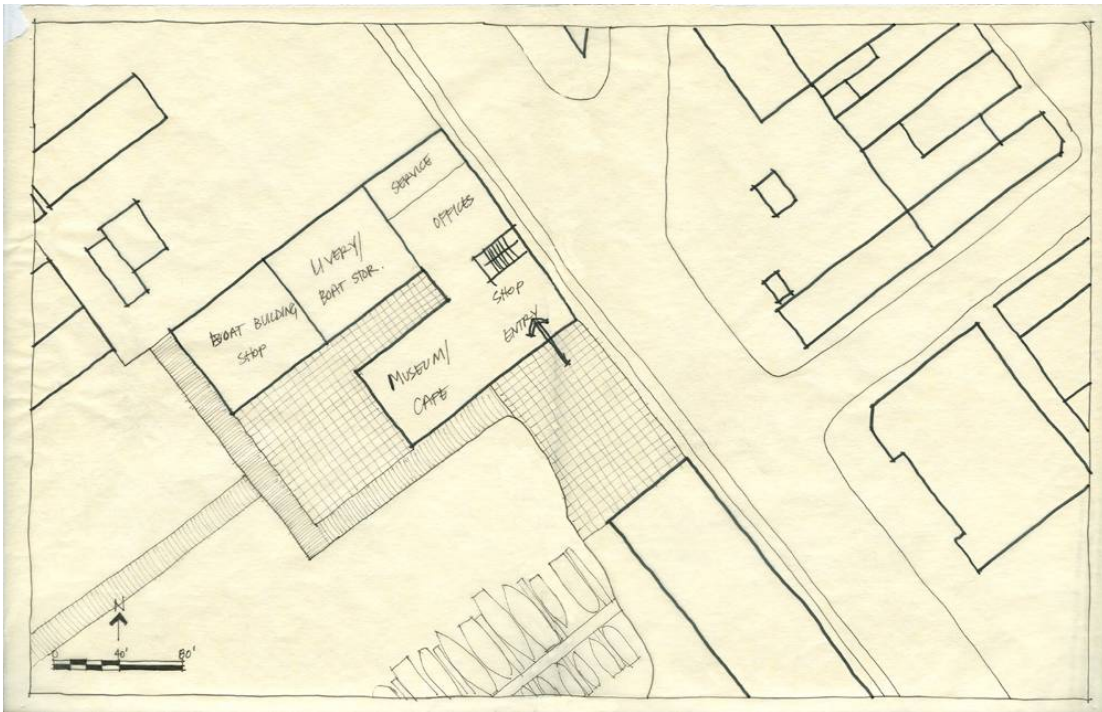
Scheme one plan showing private courtyard on the water side. The building wraps the courtyard and is open for all activities to spill out on to the courtyard.
